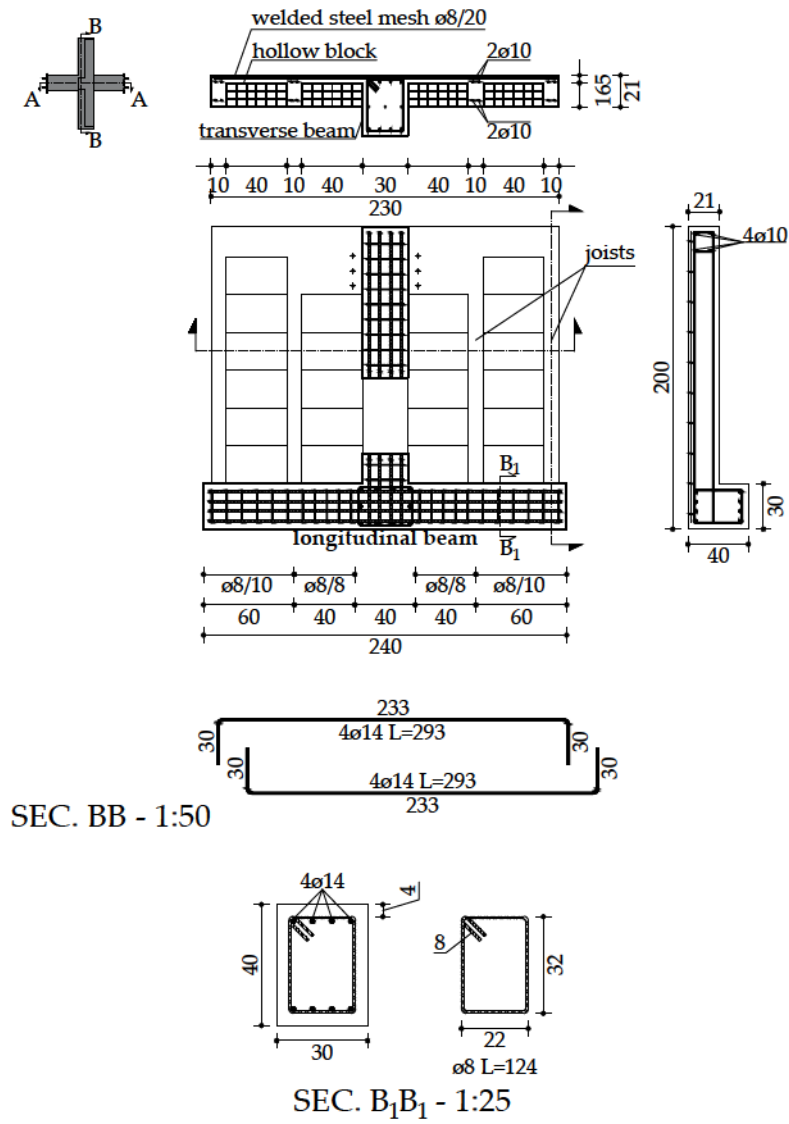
Technical details of the innovative module with the floor deck J_02_S-SEC BB (units:cm).
